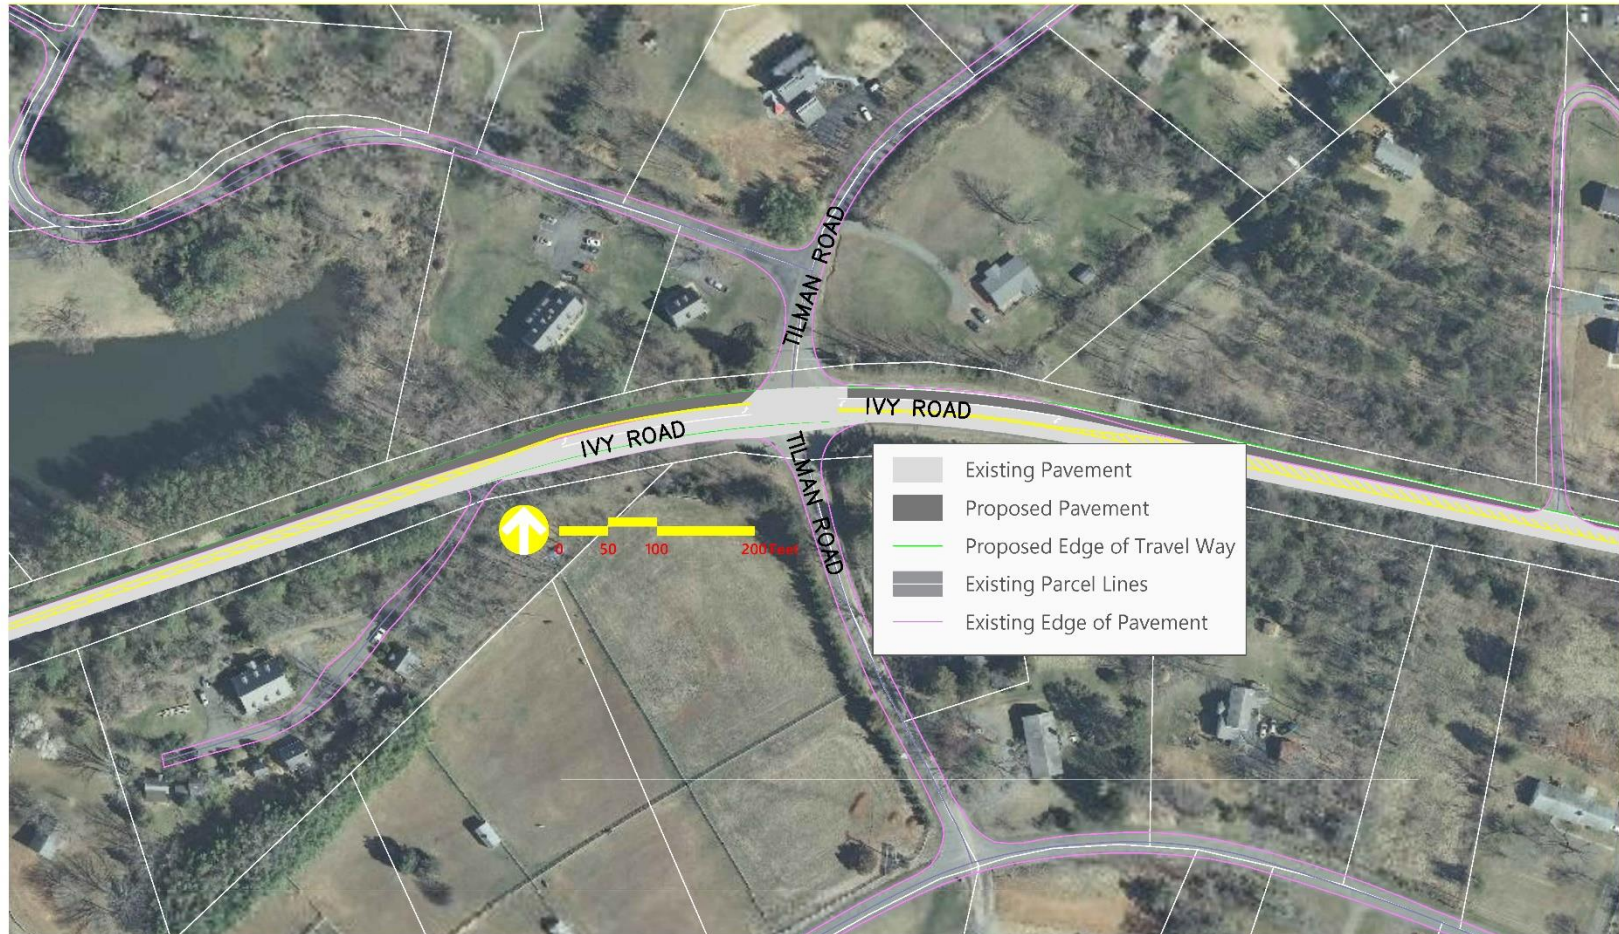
Long-Term Concept for Ivy Road and Tilman Road
